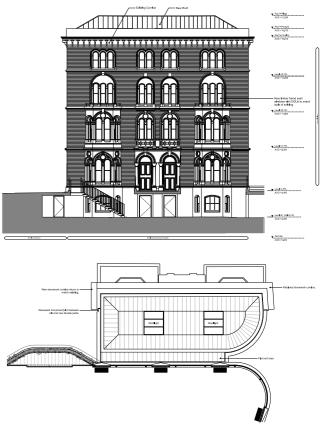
Keats House elevation and roof layout (AHMM Keats House drawings, April 2021)
